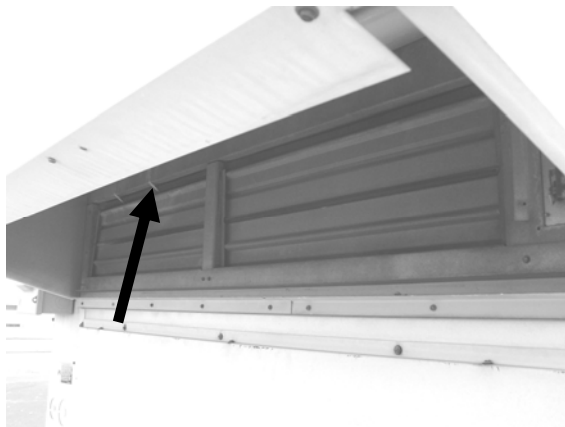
Outside air damper of annex AHU. Arrow is pointing to screws holding damper closed.
